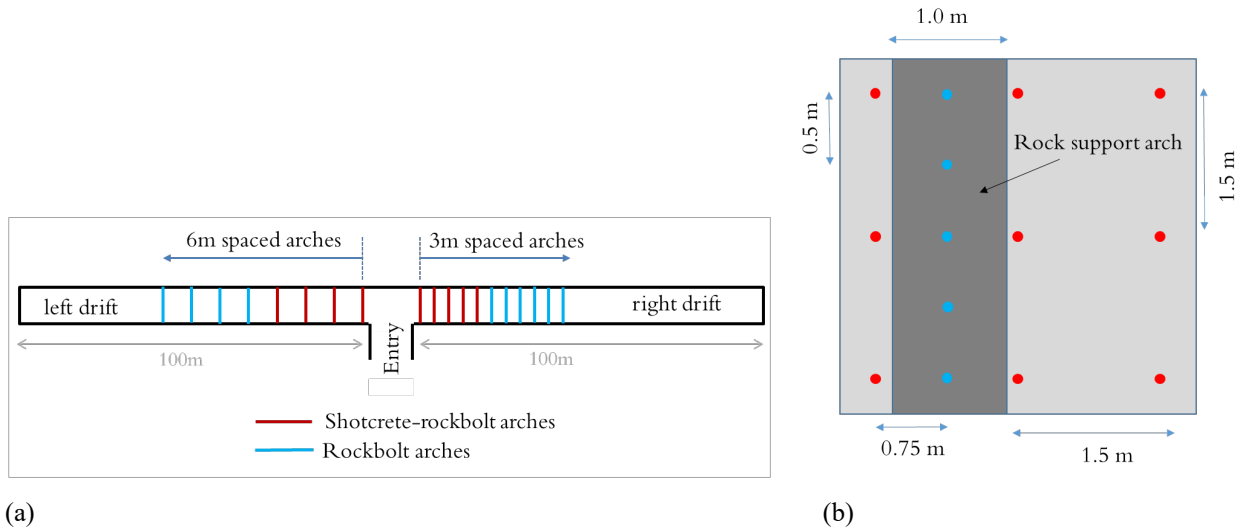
(a) Plan of the rock support arches for the field trial and (b) specification of the support arch within the routine rock support plan; the routine rock bolt spacing is 1.5×1.5 m, while the rock bolt arch is 0.5×0.75 m.
